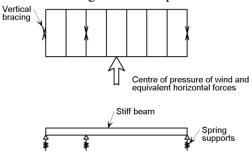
showing a Vertical bracing in a multi-Storey building
